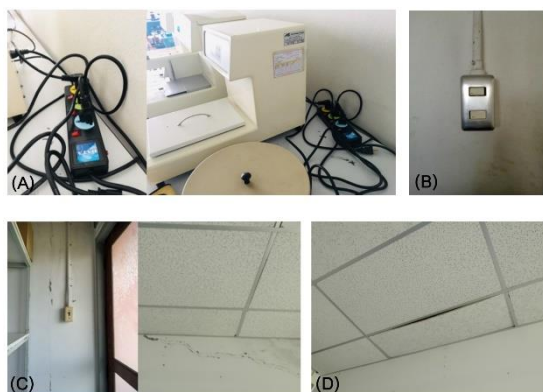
(A) Non standard wiring, plugs, sockets and use extension cord for over 8 hours, (B) Damaged electrical switch, (C) Damaged wall and (D) Damaged ceiling (before implementation)
